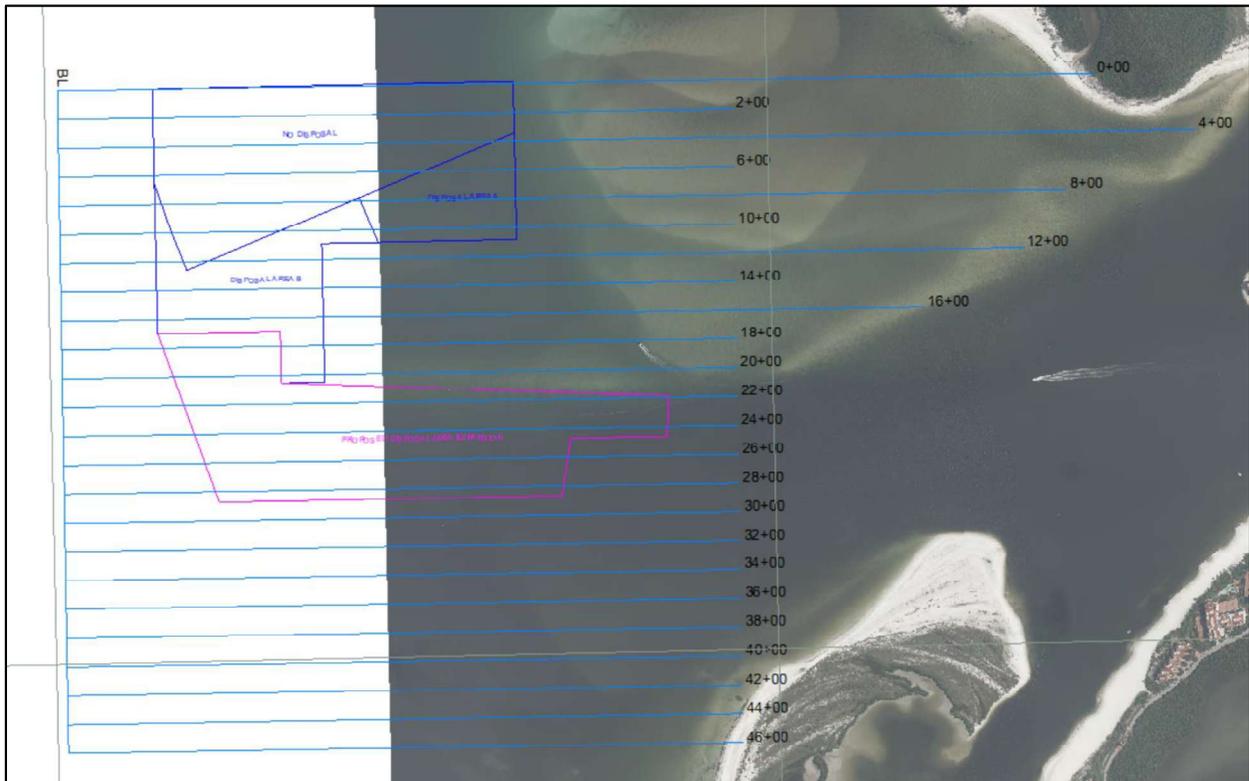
Offshore Borrow Area / Disposal Area Survey Plan.
